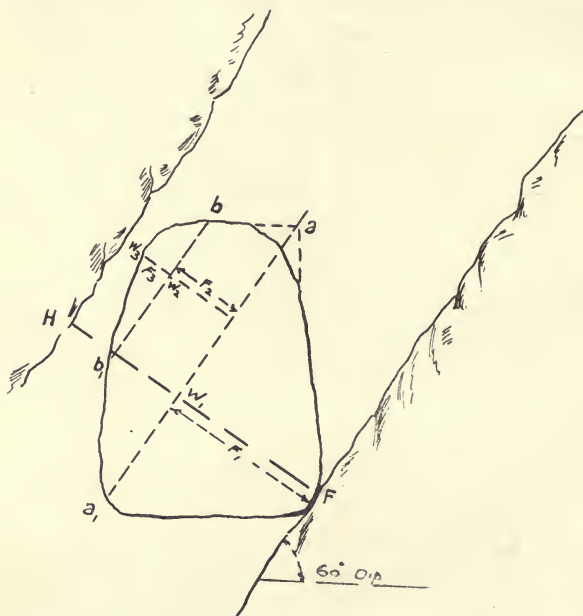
INCLINED OREBODY, ONE WALL EXPOSED.
